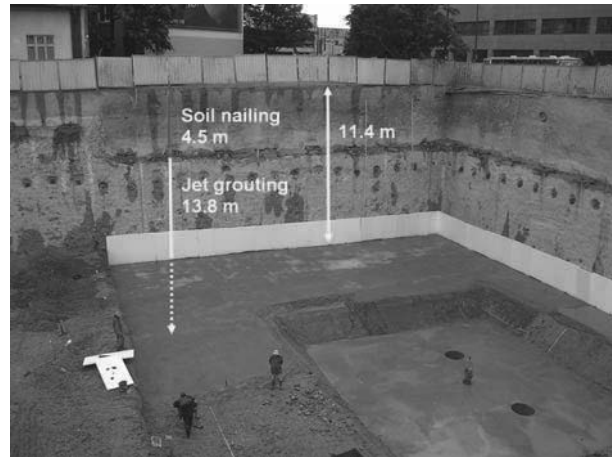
View into the excavation. Retaining structure made by soil nailing and jet grouting.
